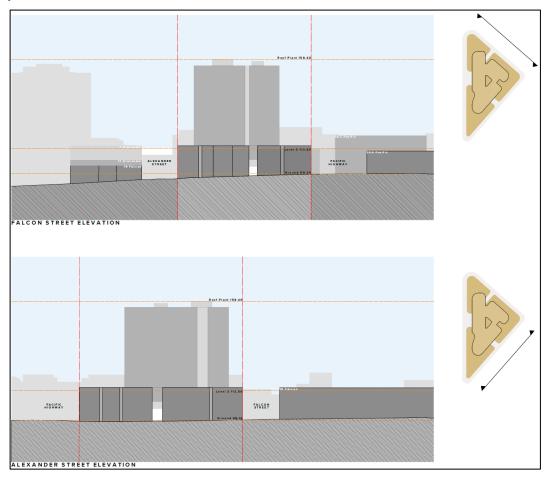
Elevations of Falcon Street and Alexander Street (source: Turner)
